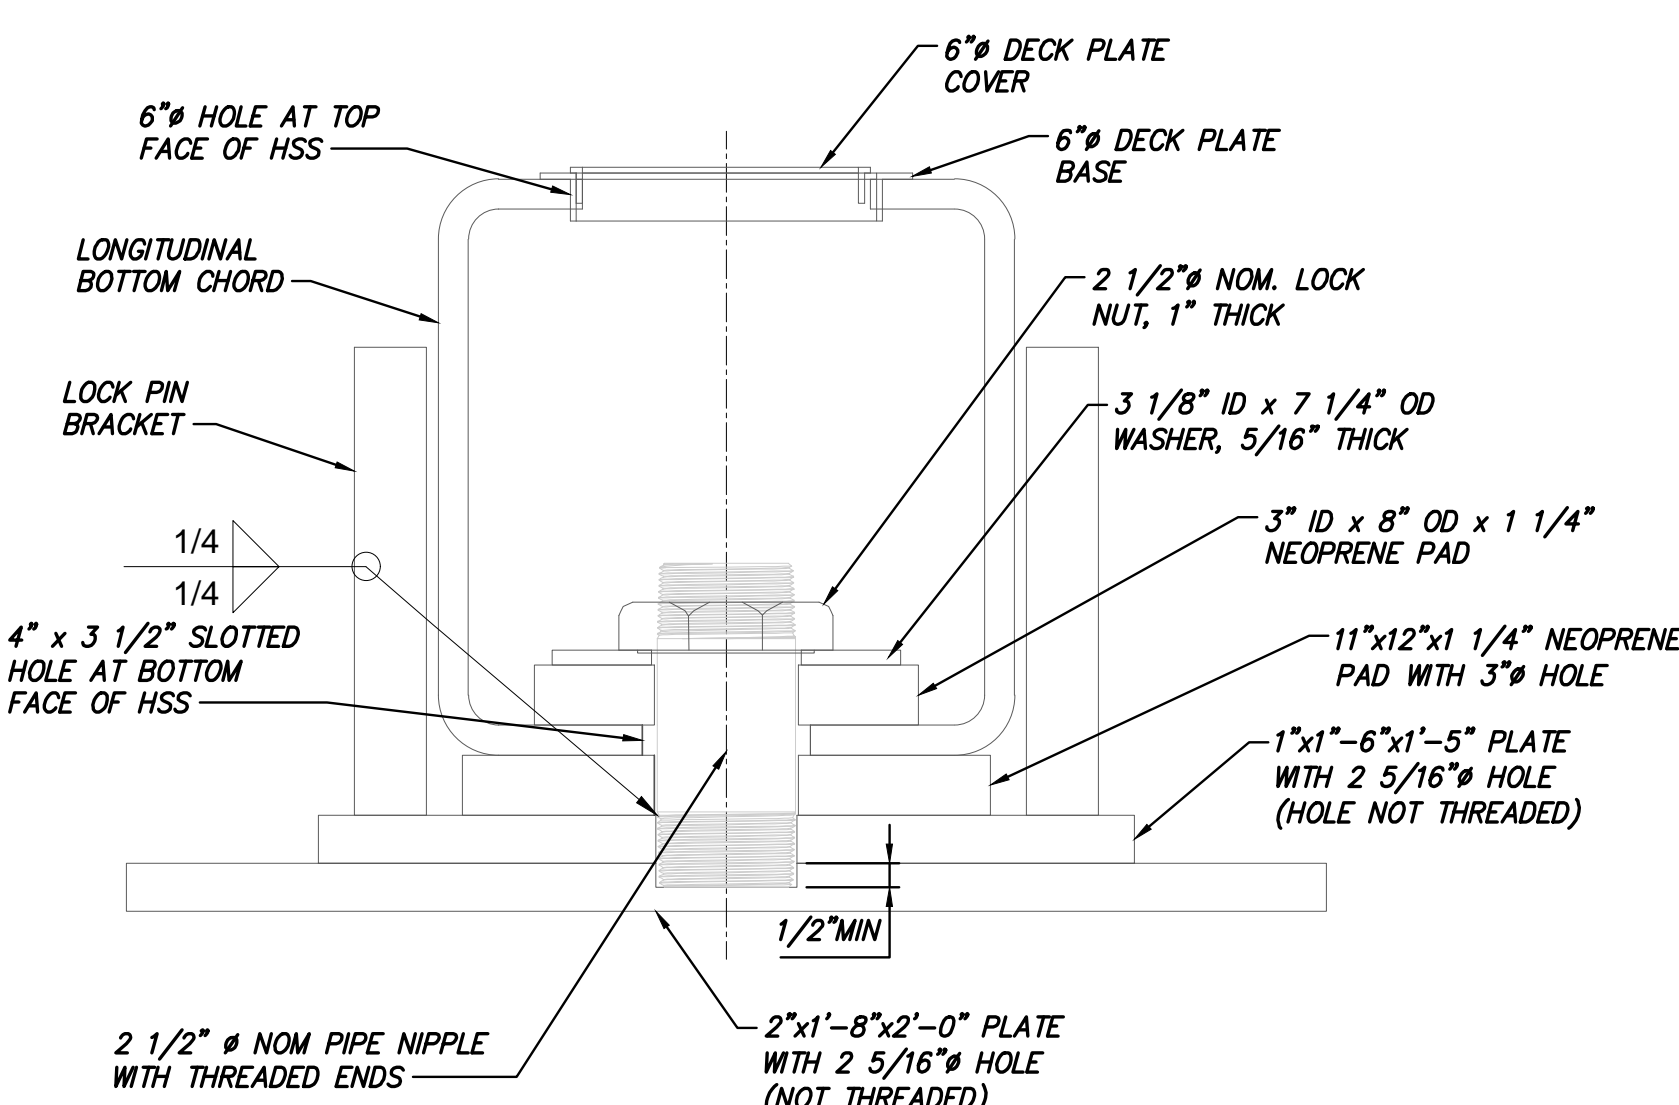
TYPICAL BEARING DETAIL AT PIERS - ELEVATION
